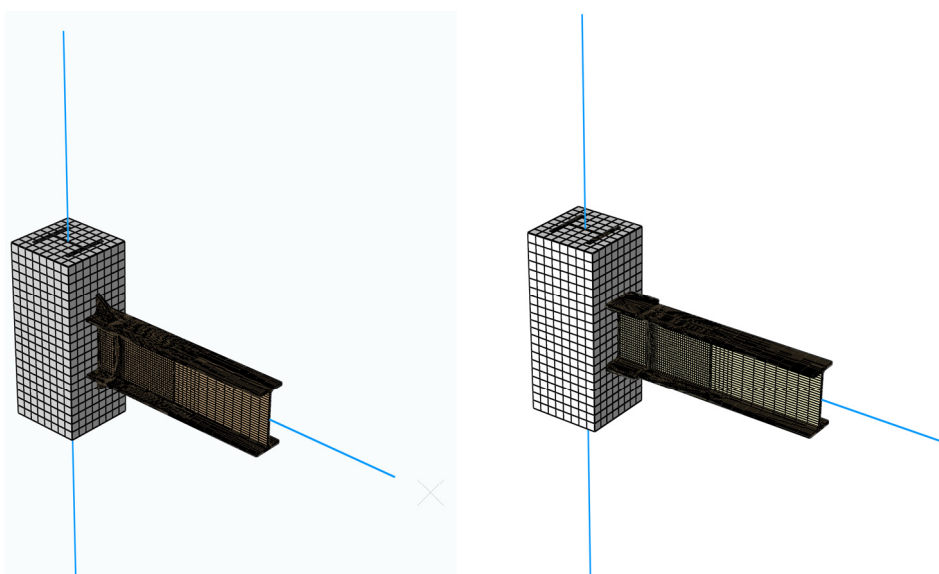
Beam-to column joint RS1 and CP1 finite element model
